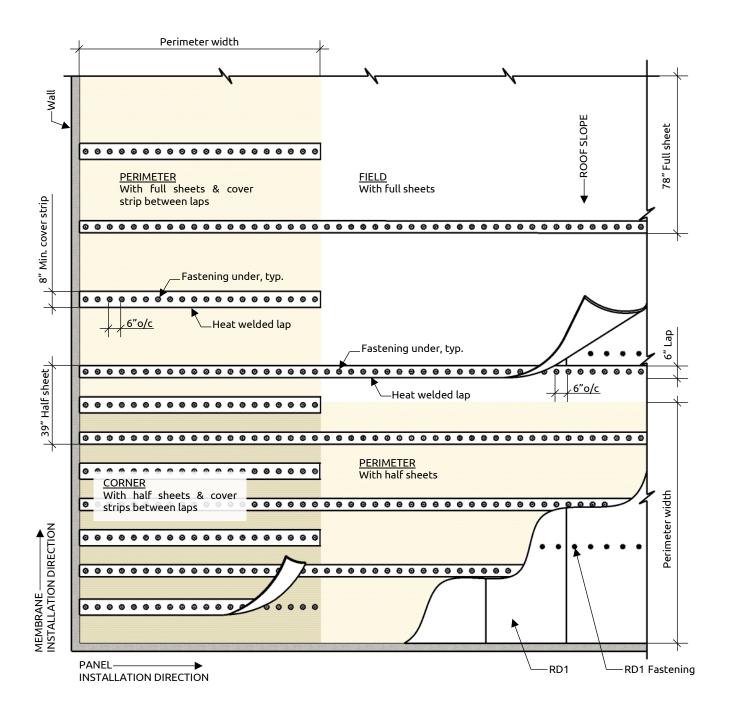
OneDek® MA-6-105 mechanically attached TPO/PVC membrane- 6" o/c (using perimeter half sheets)
